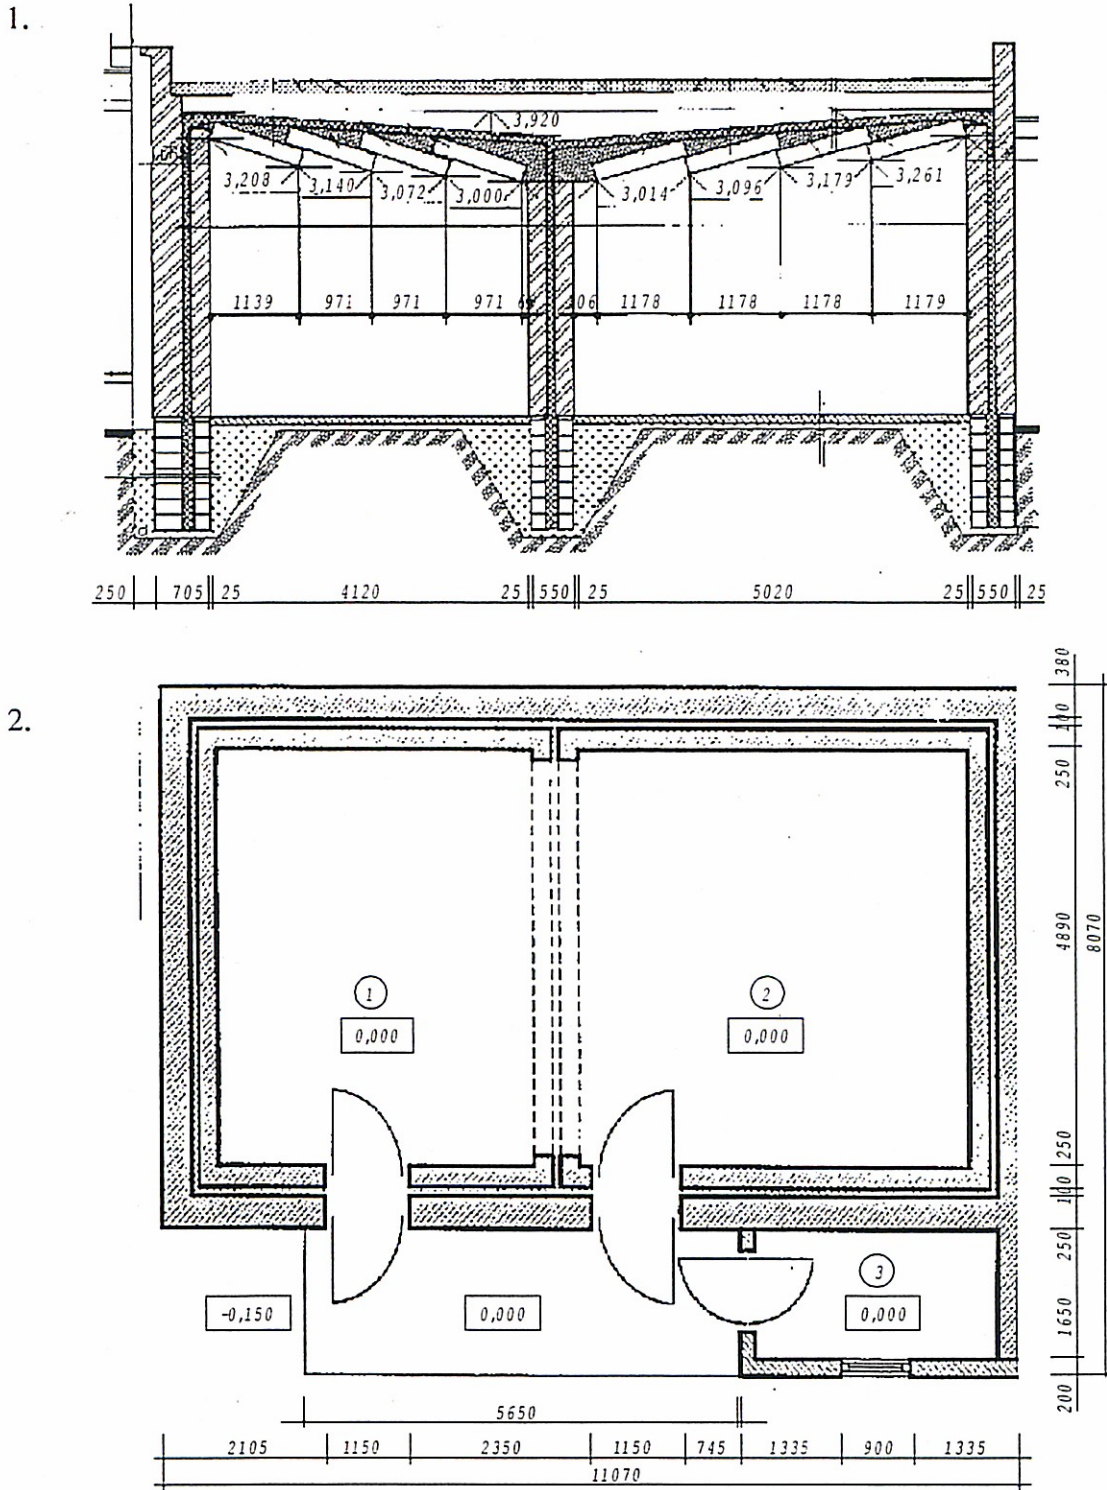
The general view of construction of the laboratory for sound insulation measurements of building elements
